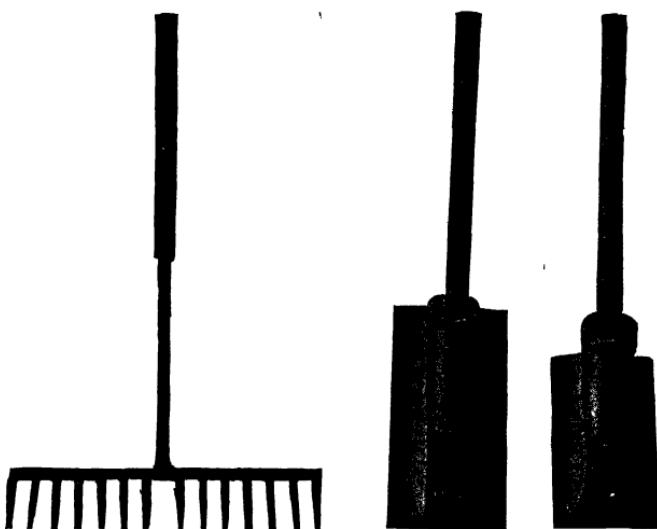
Rake and Smoothing Irons Used in Laying Asphalt Pavement
